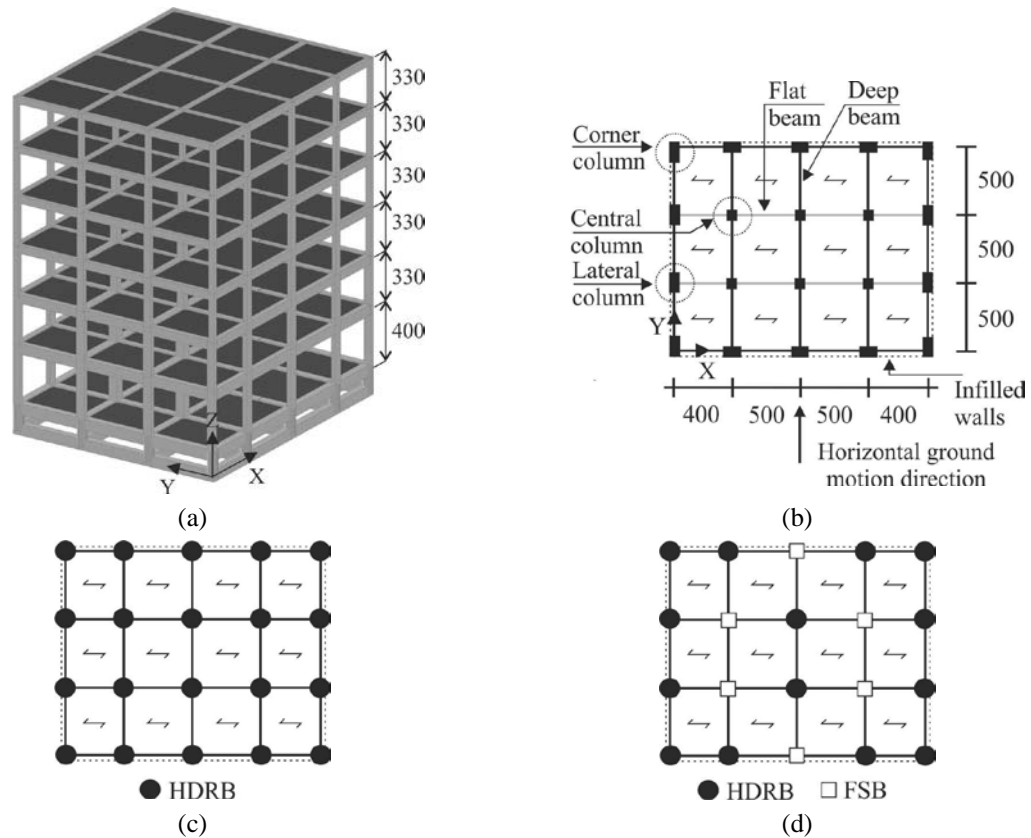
3D view and plans and of the base-isolated structures (units in cm).
